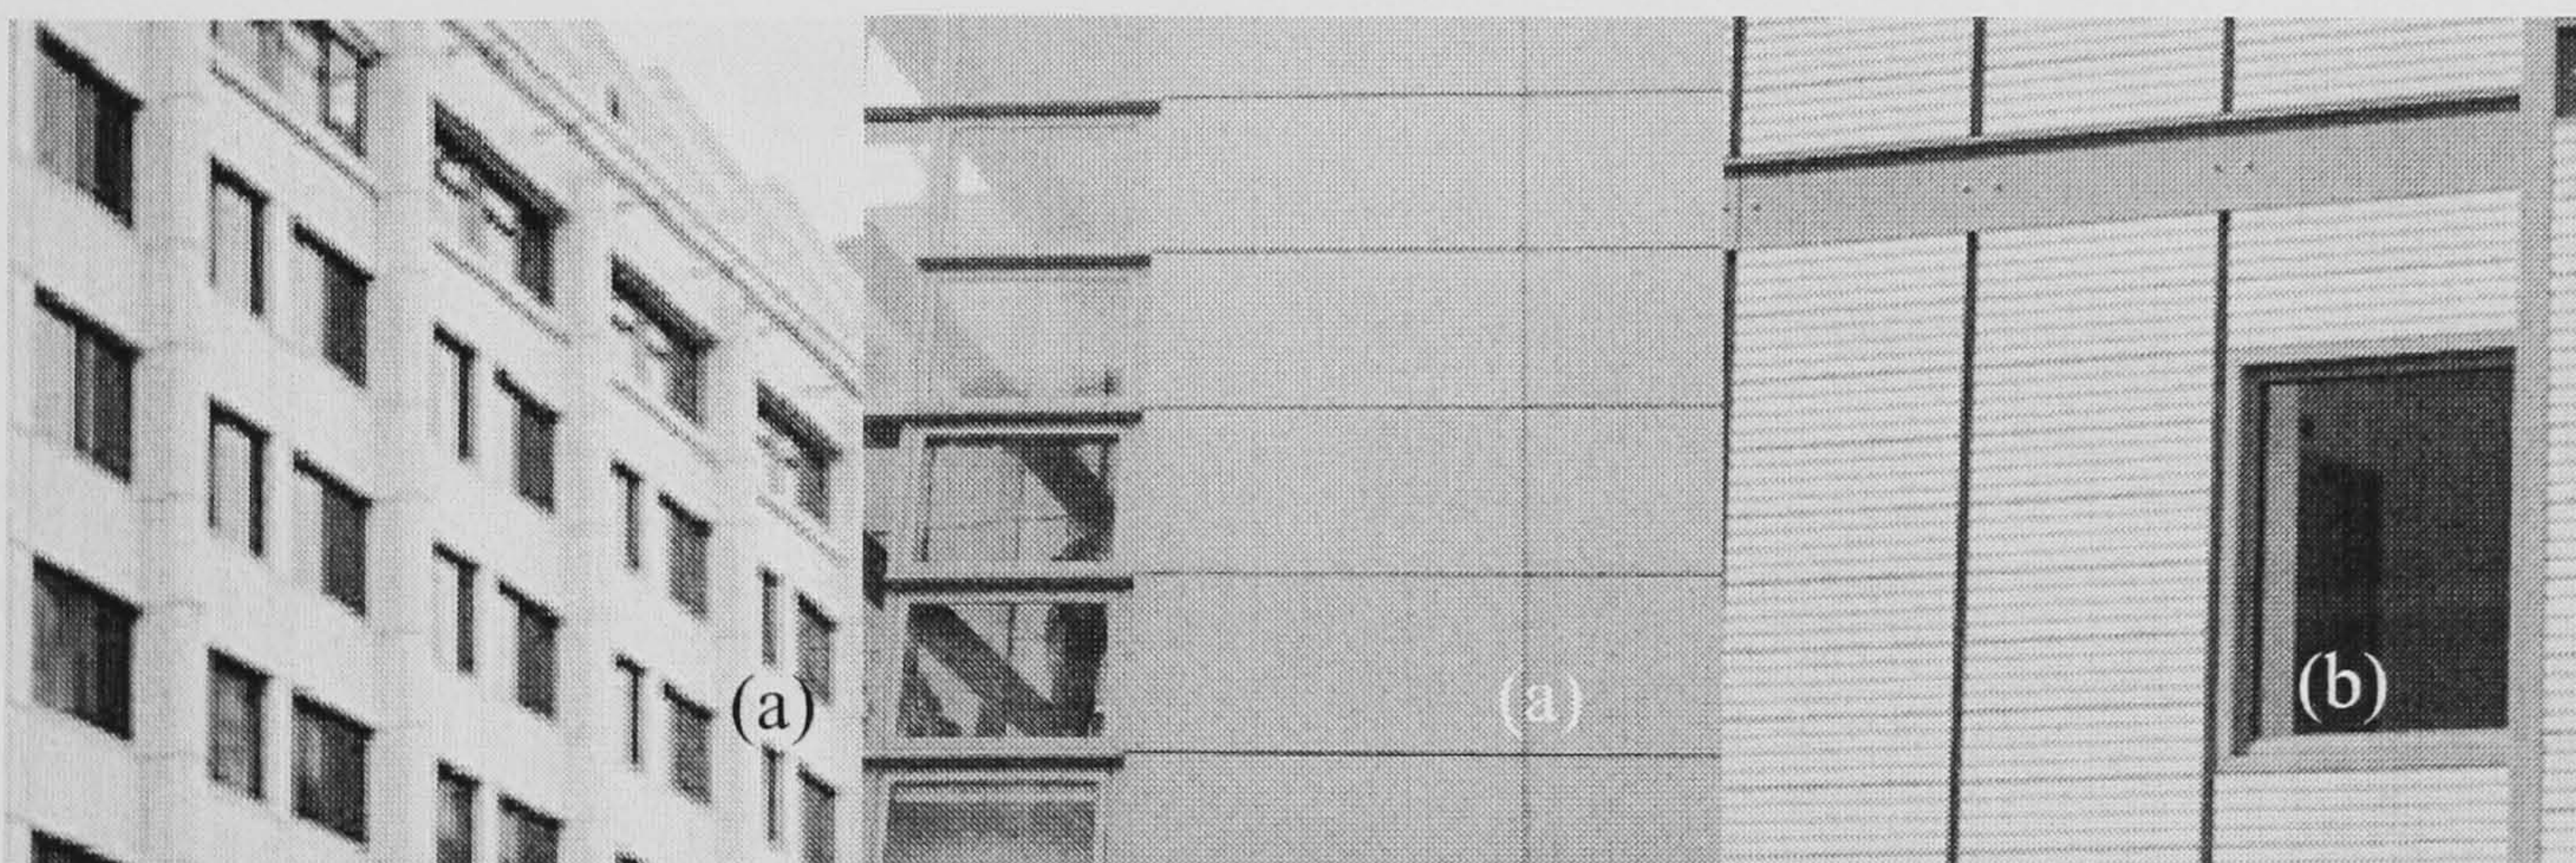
Lightweight cladding, (a) metal cladding (b) terracotta cladding.
